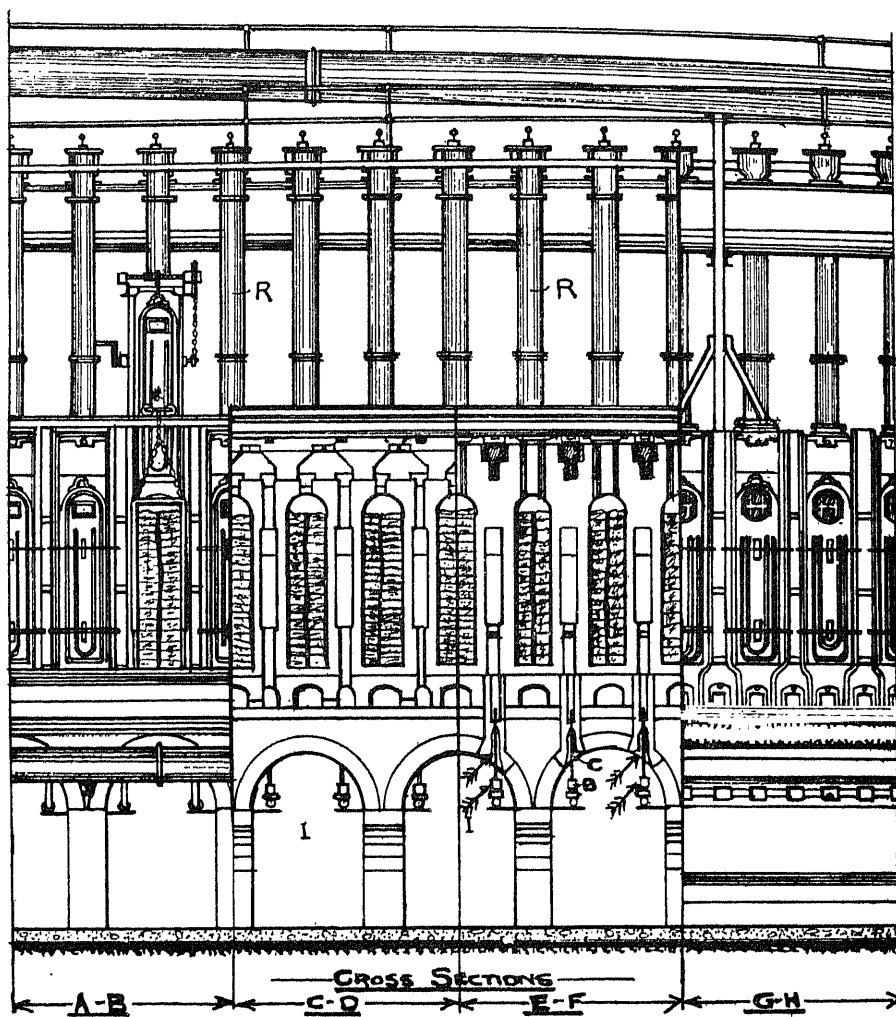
Four Cross-Sections and Part Elevation through Waste-Heat Oven of "Otto" Coke Oven.
